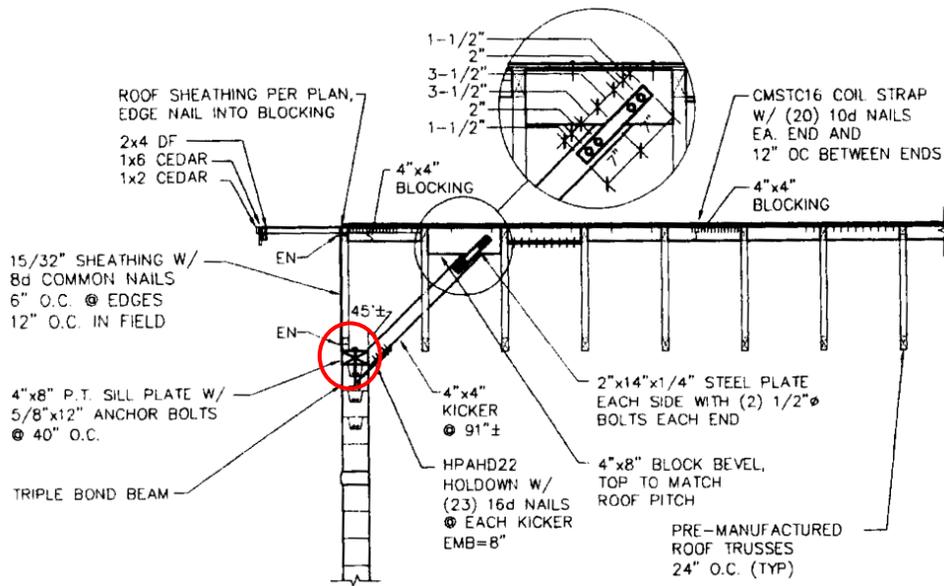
Inadequate Connection between Sheathing and Masonry Wall Top Plate
